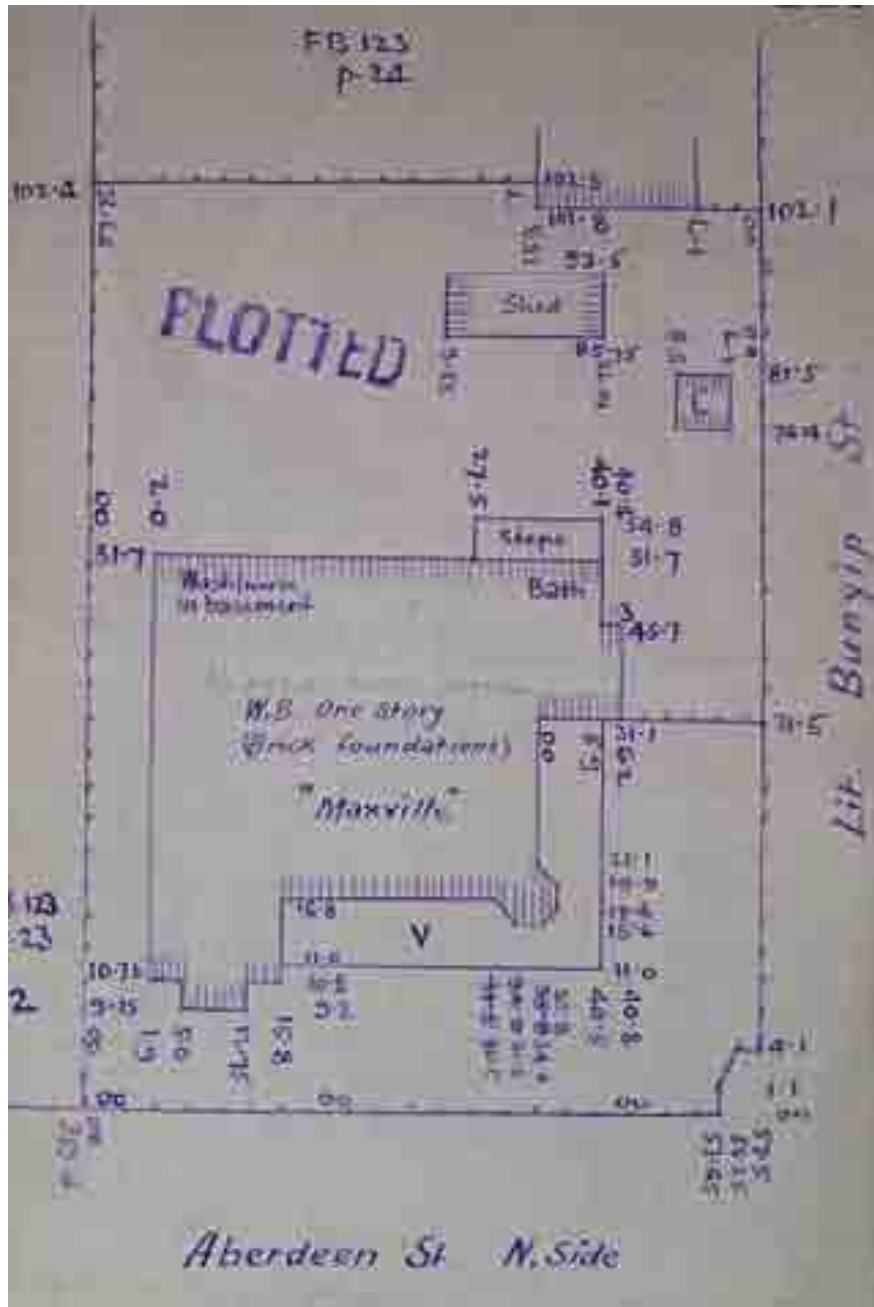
Sketch plan of “Maxville”, 10 Aberdeen Street, c.1914, showing annotation that reads “washhouse in basement”. Source: Geelong Waterworks & Sewerage Trust Fieldbook, no. 33, p.144, Barwon Water collection.
